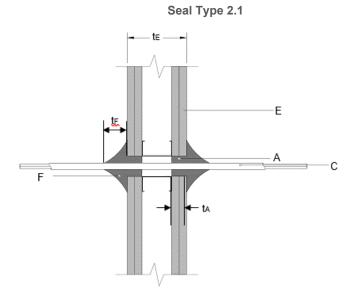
Single Cable in aperture ≤ 40mm with sealant fillet, type 2.1
